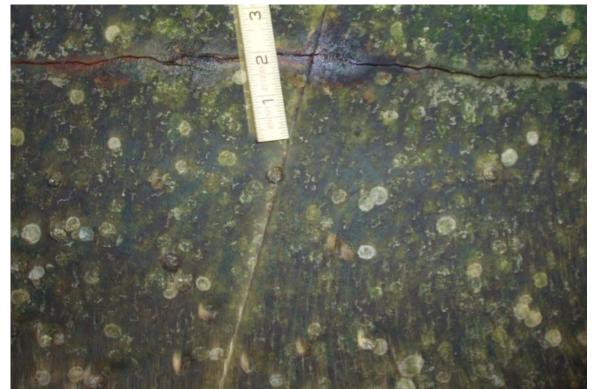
CRACKING IN UNDERSIDE OF BENT 144 PILE CAP
